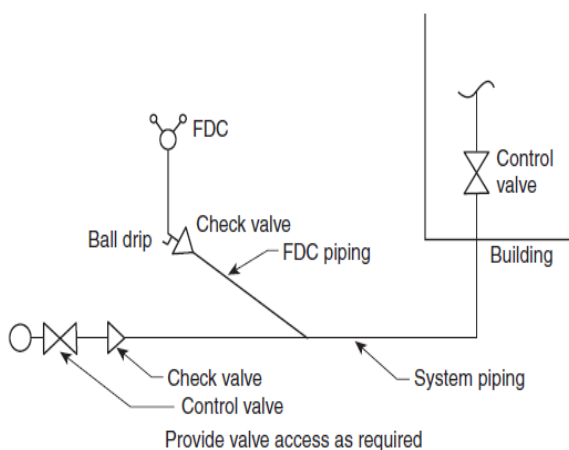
(a) Fire Department Connection Connected to Underground (Sample 1).
